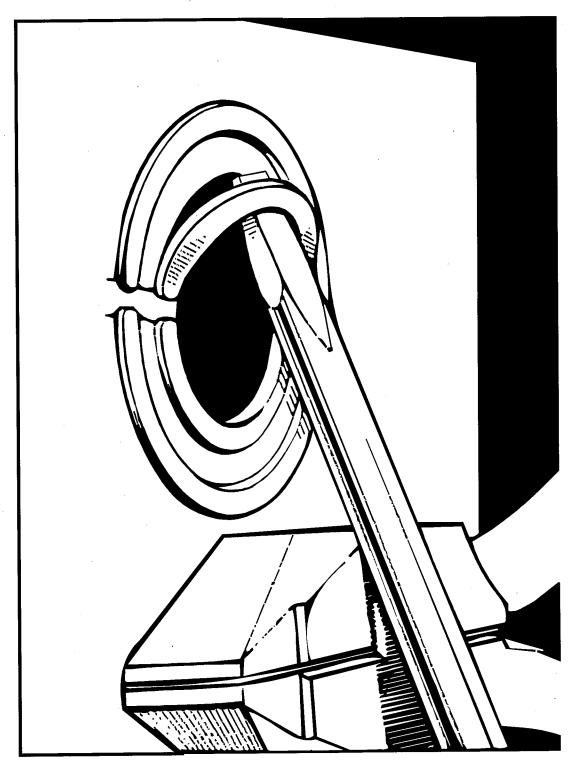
KNOCKOUT REMOVAL—STEP 2
